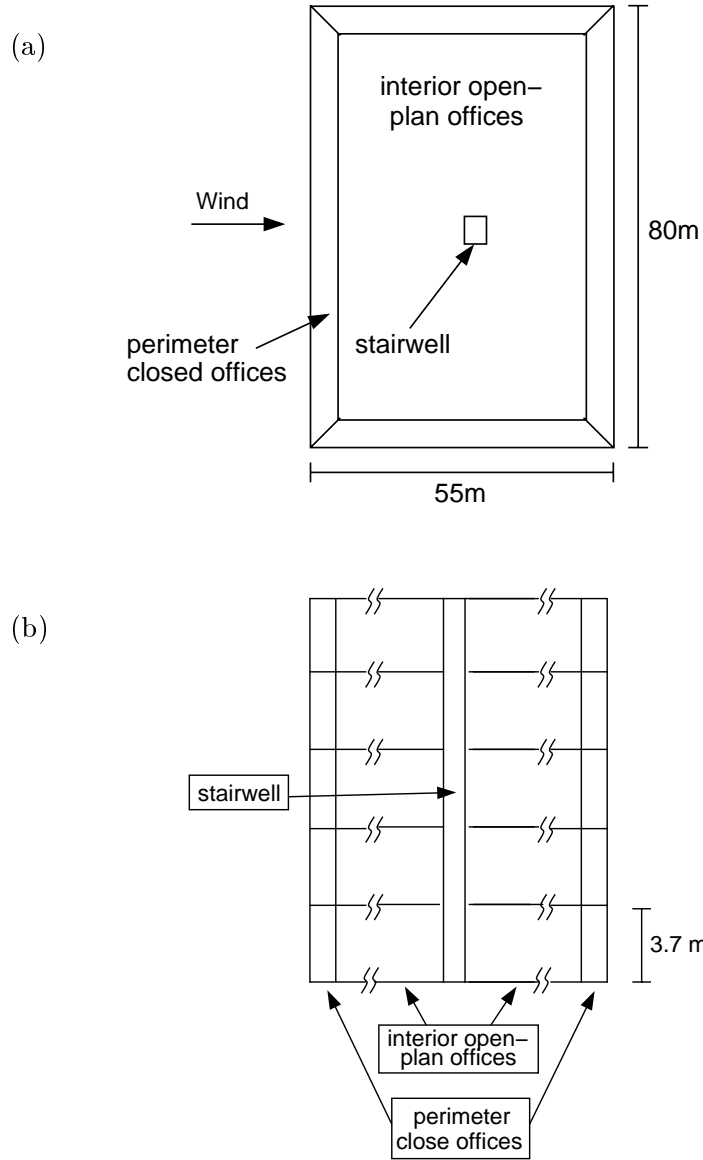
Illustration of the (a) plan and (b) cross-sectional views of the prototypical open-style commercial building. The floorplan is identical on each floor. The first floor has doors and hallway on the upwind-side of the building connecting the outside with the interior open-plan offices. Based on five-meter square offices, the long- and short-side perimeter zones represent fifteen and ten offices, respectively. The height of each floor includes any plenum area above the occupied space. Each office is connected to the interior space by a closable door.
